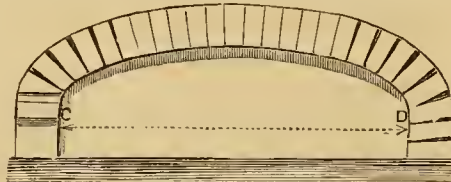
SECTION THROUGH C, D, FIG. 1.
